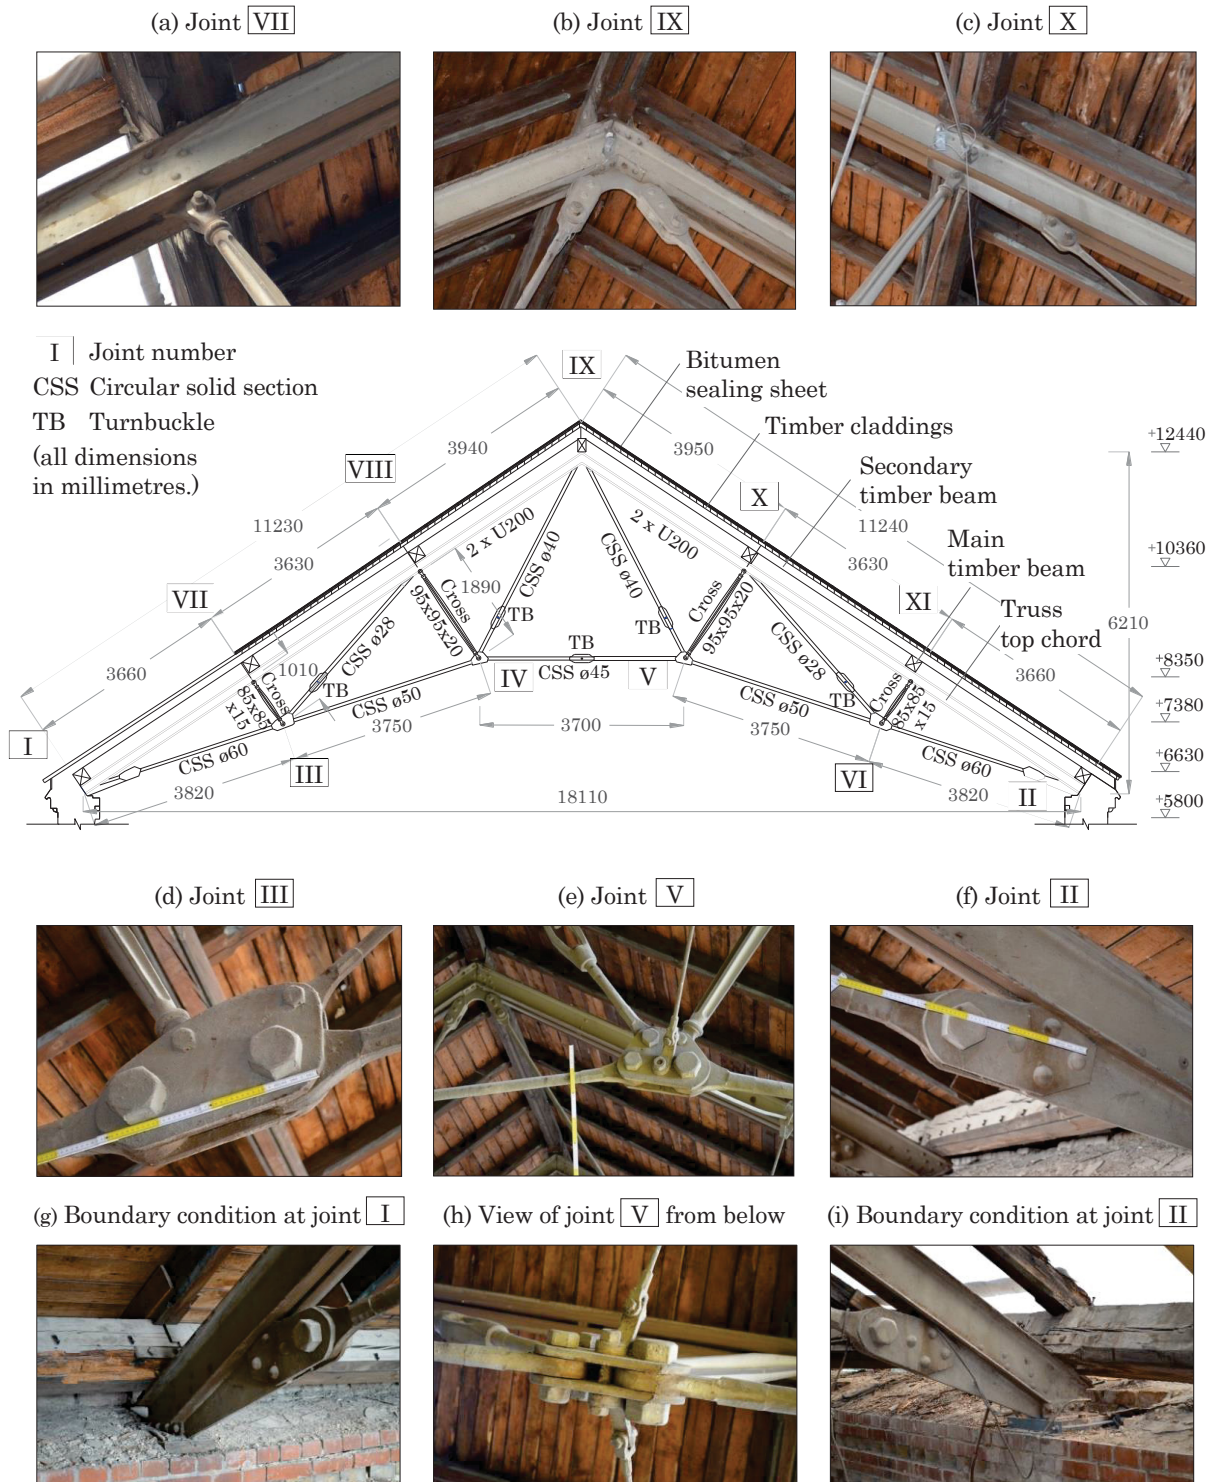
Detailed view of one single truss system at *Reithalle* in Potsdam and selected joints.
